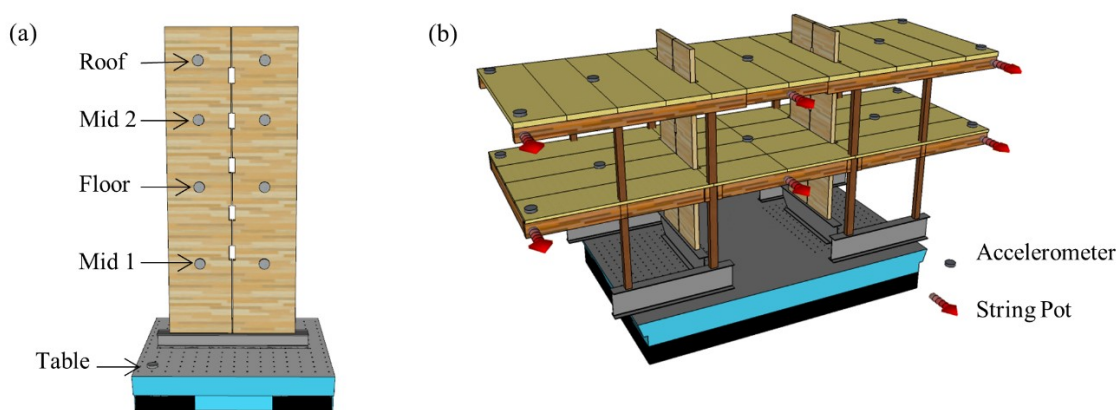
Accelerometer plans: (a) Rocking wall, (b) Diaphragm
